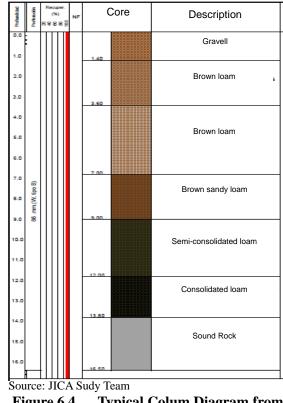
Typical Colum Diagram from the 4th Bridge to Arraijan
